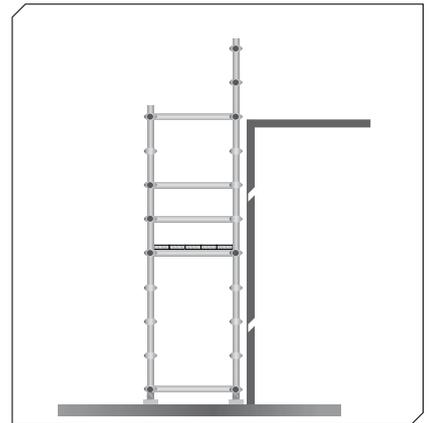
(f): Inside standards supporting guardrailing adjacent to a flat roof structure.
